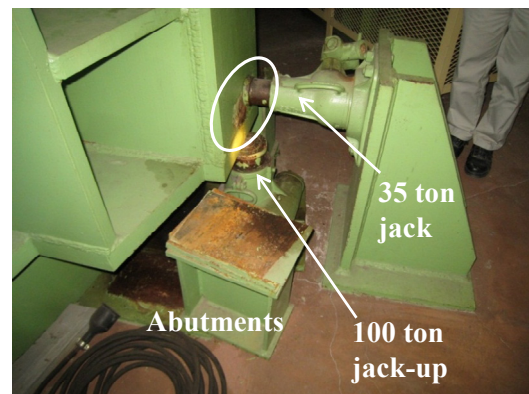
Photo of the moved weight supports and jacks at the 4th floor.
